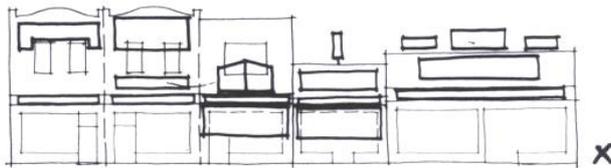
also shows that a building may be given a horizontal or vertical appearance simply by the way in which the sign panels are arranged across or down a building.
